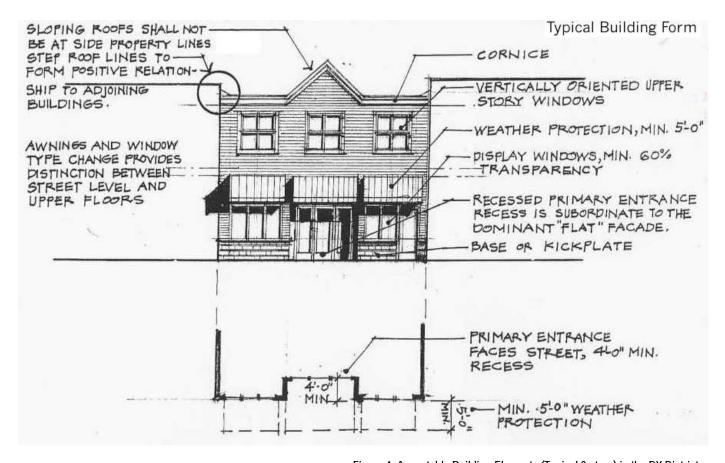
Acceptable Building Elements (Typical 2-story) in the DX District
